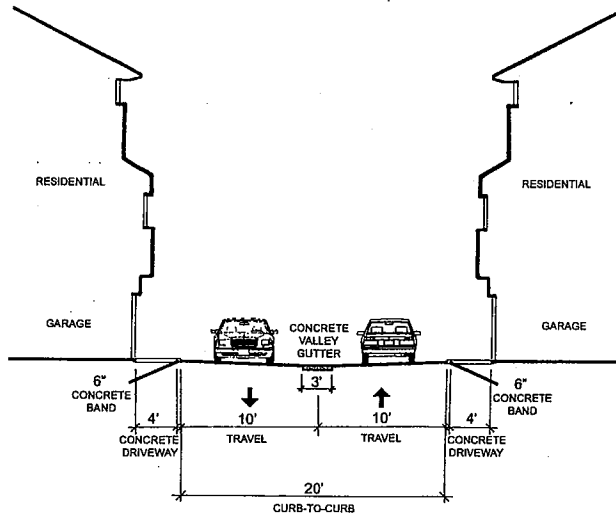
D.29: Cross Section of Typical Private Court Roadway (2)
